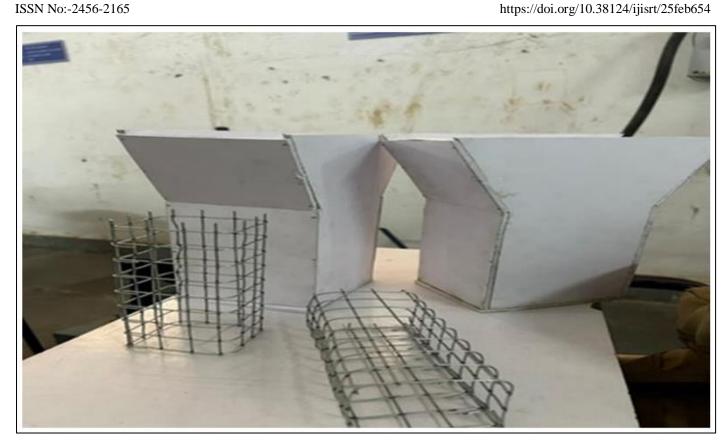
Shuttering and Reinforcement for the Pillars of Bridge.
